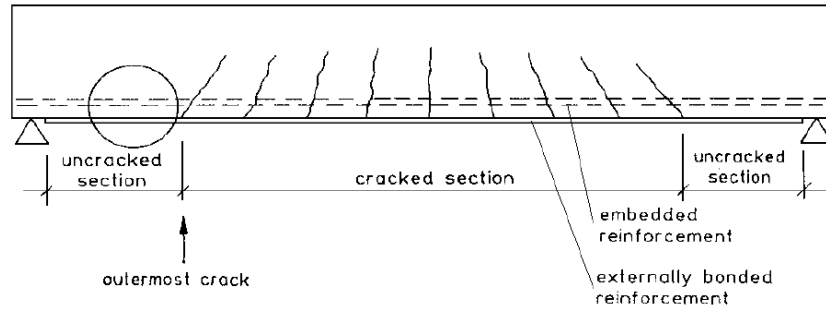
Anchorage zone beyond location of last crack [7, p.54]
